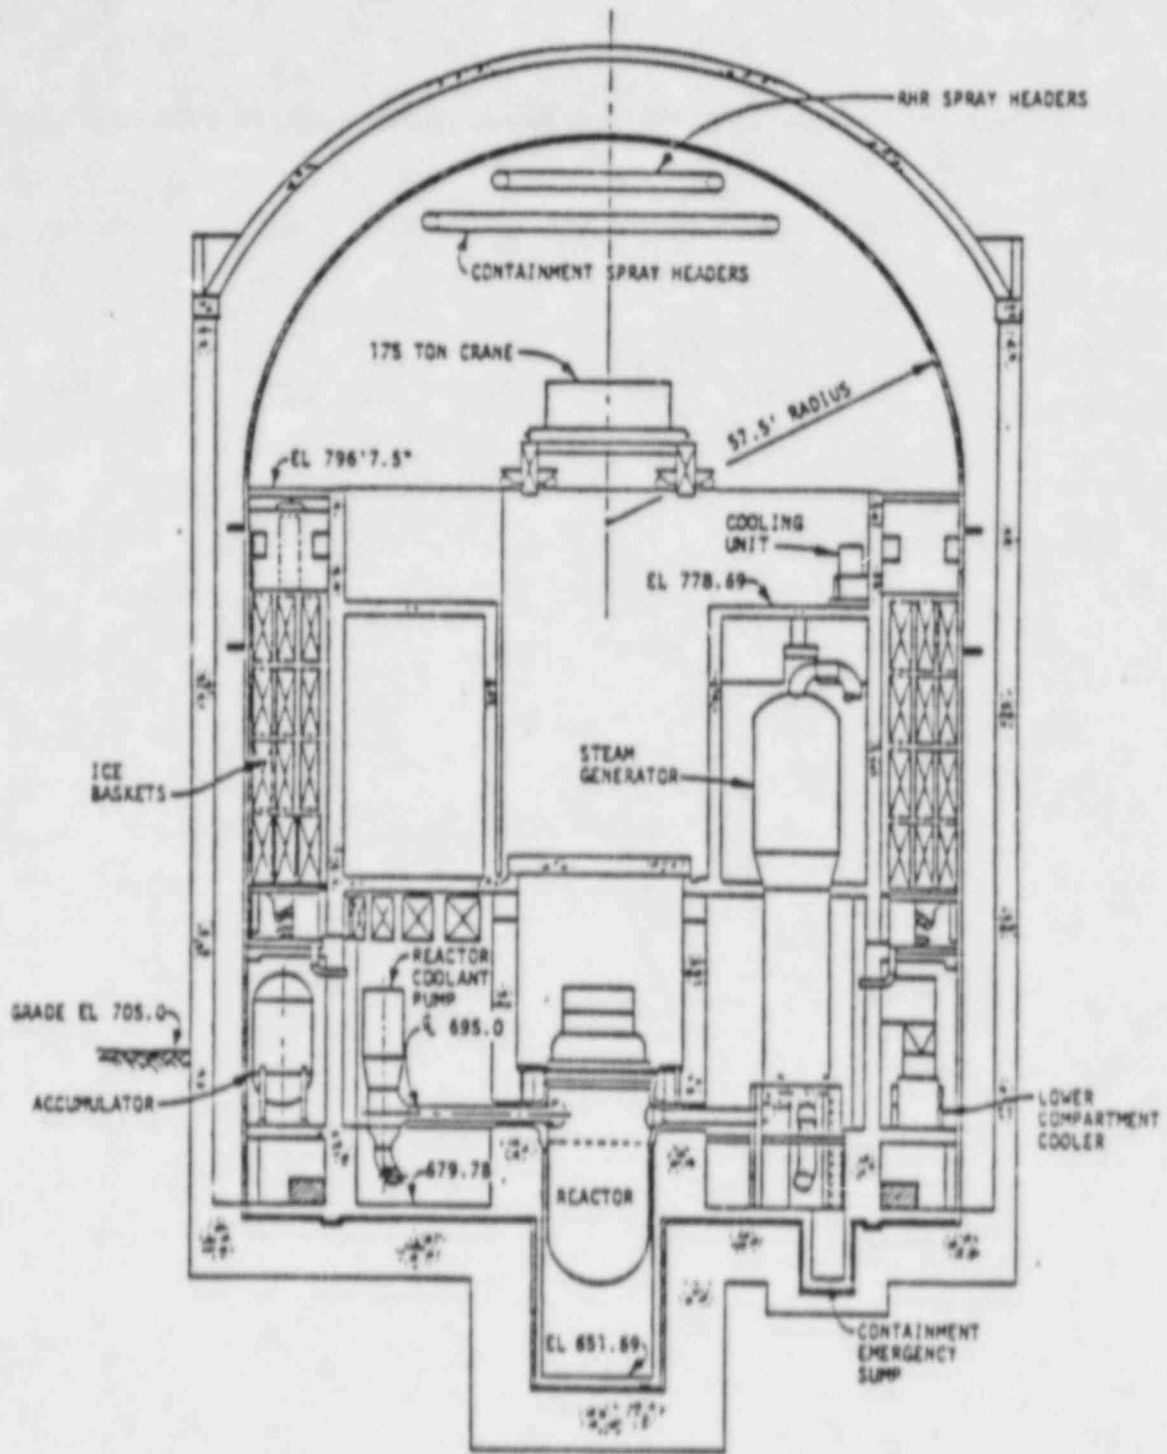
CONTAINMENT CROSS SECTION
